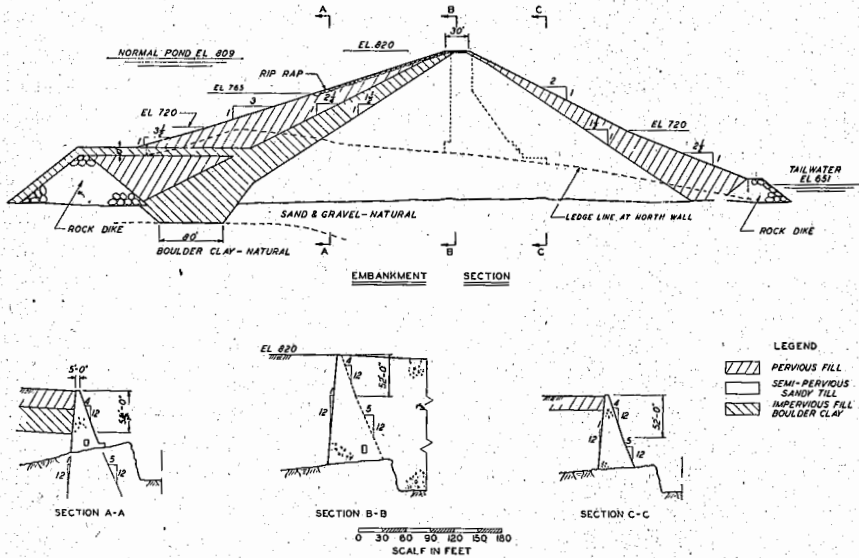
NORTH EMBANKMENT AND RETAINING WALL.
